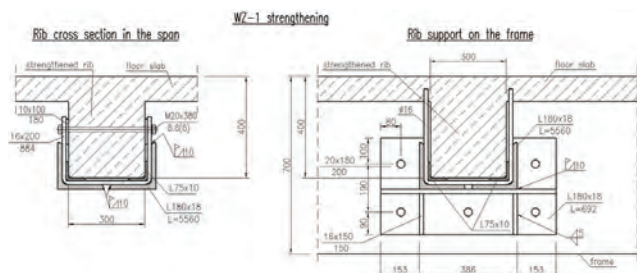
Strengthening WZ-1 of the floor beams of part B at the level of +4.20
